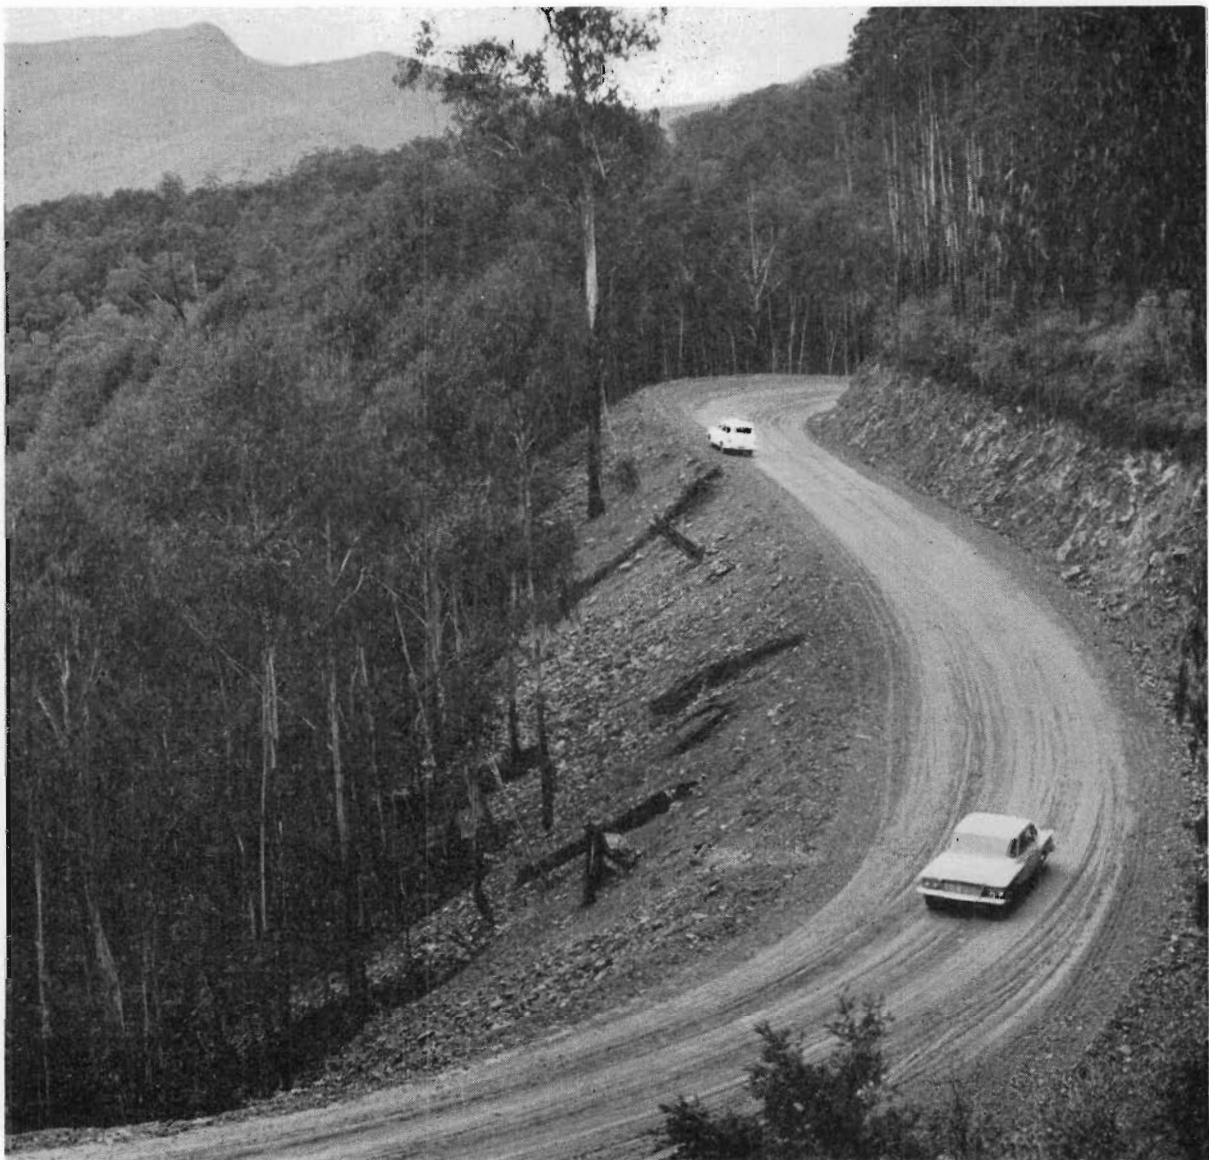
Bright Shire, Alpine Road. A section reconstructed with fine crushed rock.
